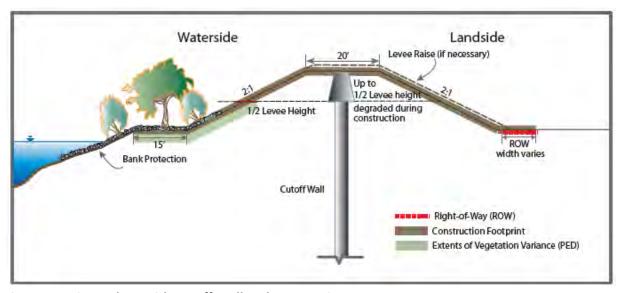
Fix-In-Place with Cutoff Wall and Levee Raise.
